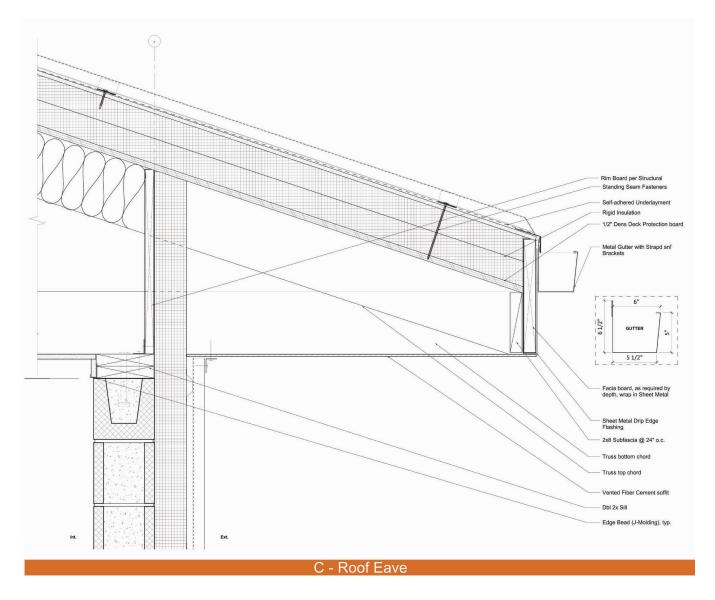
UNOCCUPIED BUILDING ROOF / WALL DETAIL
